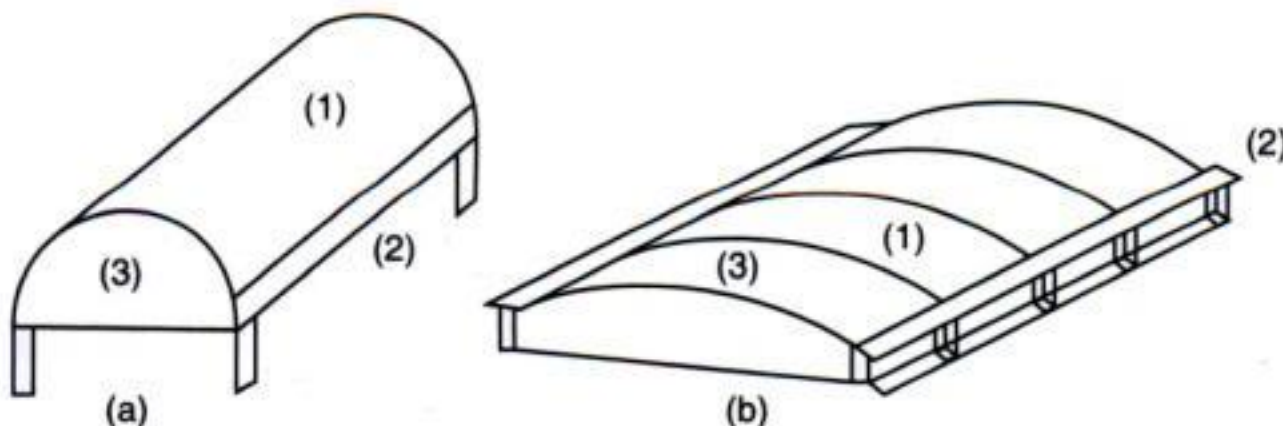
Classification of circular cylindrical shell: (a) Long shell with vertical edge beam, and (b) Short shell with horizontal edge beam; (1) Shell, (2) Edge beam, and (3) Transverse stiffeners-beams or frames for long shells and arches for short shells.
